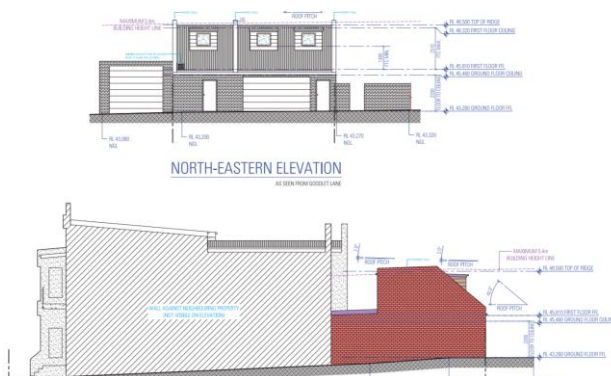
Approved drawings for D/2018/742, showing a new building at Goodlet Lane that would contain additional working rooms. The approved building has not been constructed.
